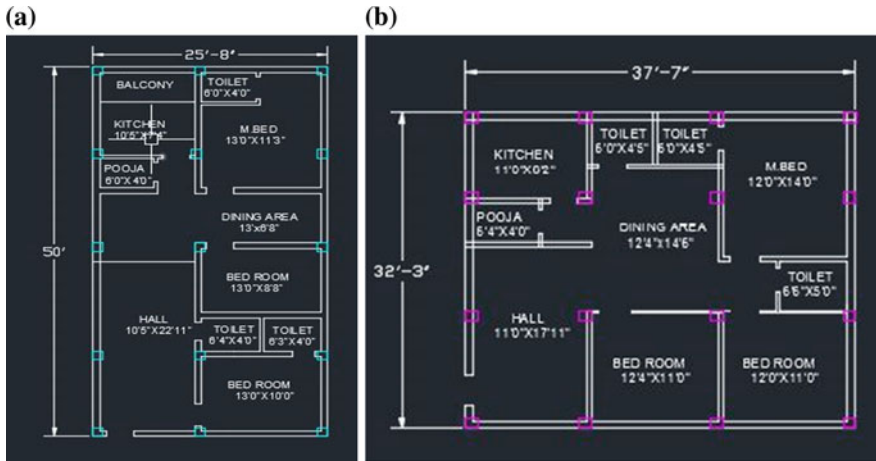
a Floor plan of 25 storied building, b Floor plan of 20 storied building
